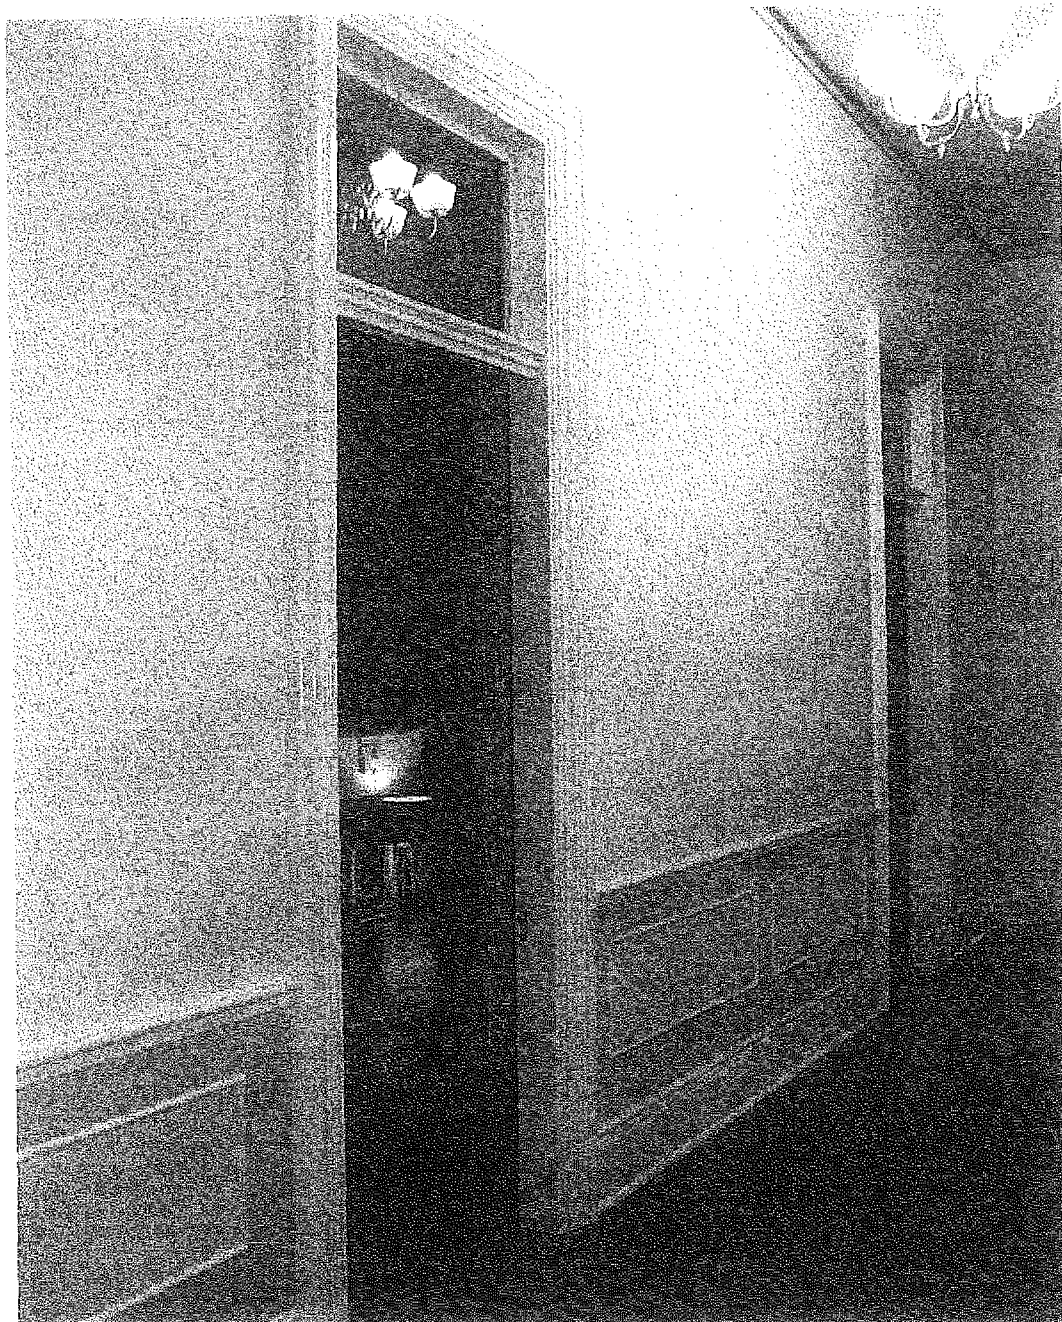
Moldings of hall interior doors. As noted in text these were built up from simple forms and are not single pieces.
